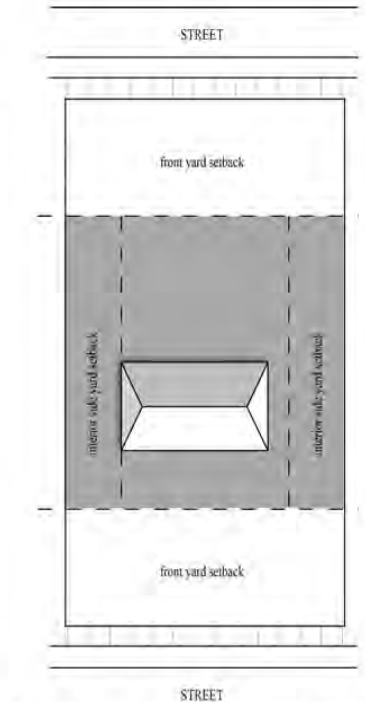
Residential Parking Locations: Through Lot. Parking is allowed in shaded areas and on driveways in approved locations.
